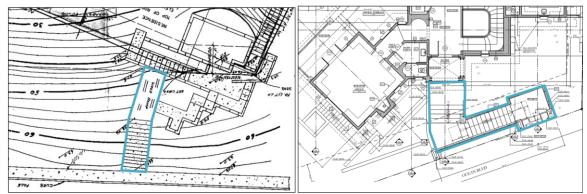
Existing Stairs (top) and Proposed Stairs (bottom) highlighted in blue
